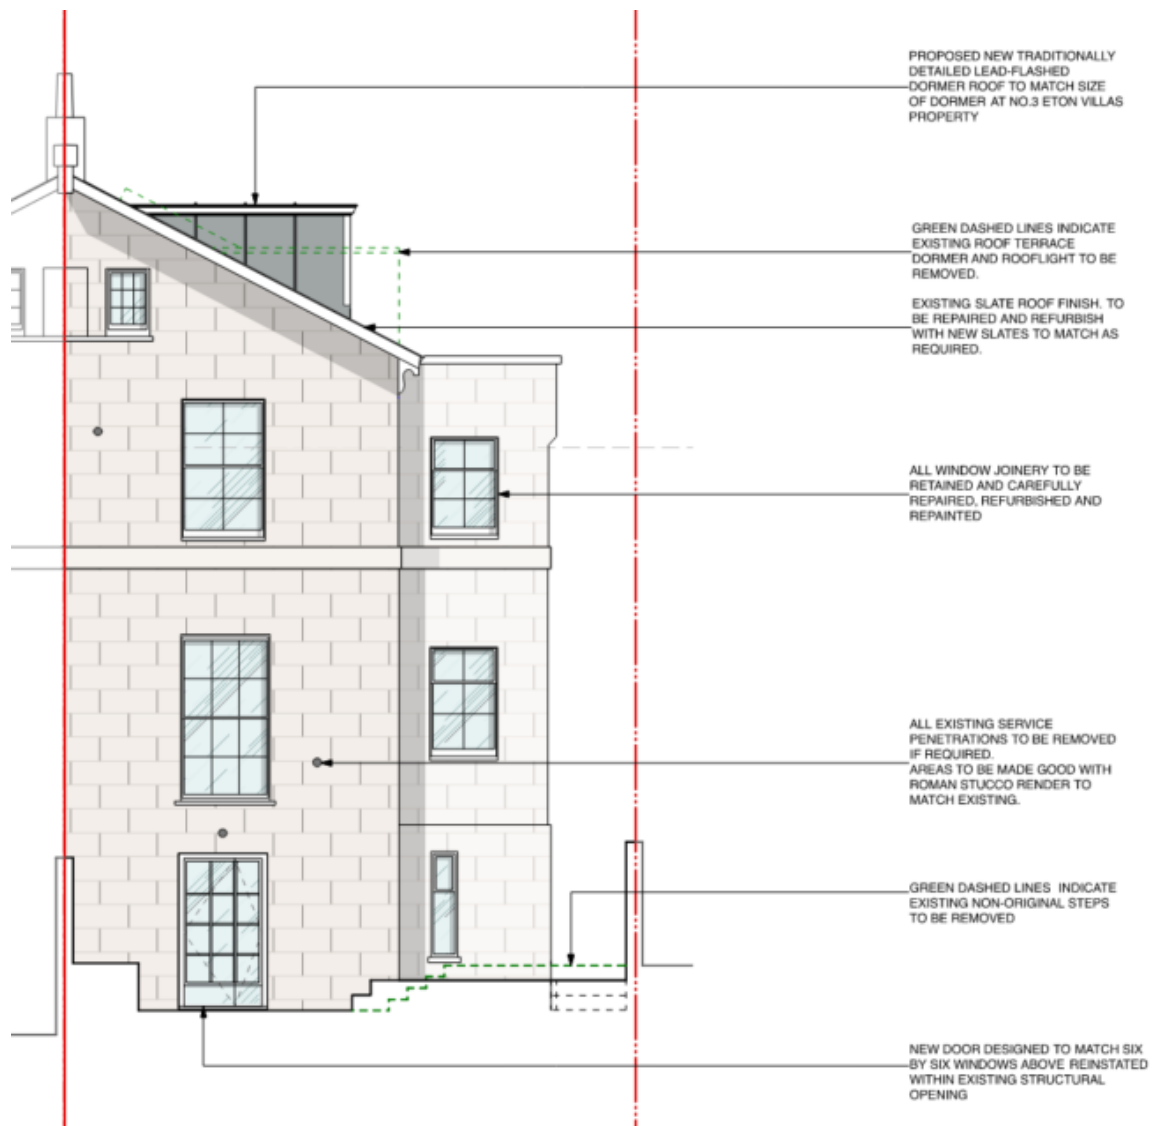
Consented elevation drawing for 4 Eton Villas (2018/3788/P), showing no external painting.
